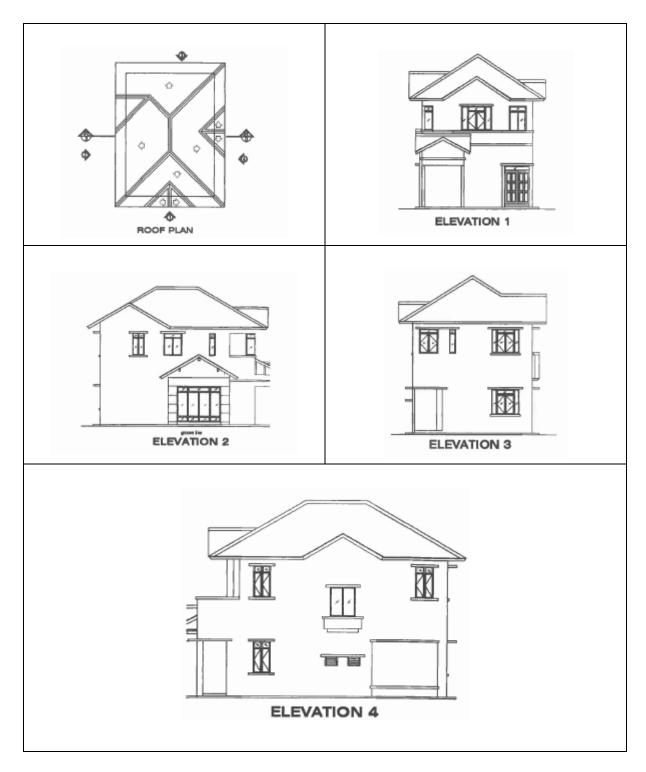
Completed layout of double storey house, the floor plans and elevation of the building
